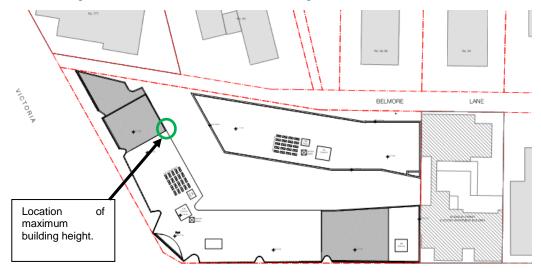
Extract of the amended Roof Plan prepared by SJB, showing the location of the proposed maximum building height circled in green (Source: SJB).
